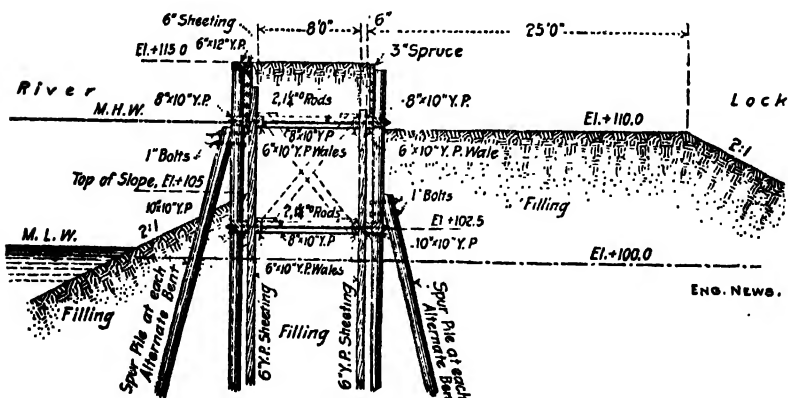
Details of Double Wall of Sheet-Pile Cofferdam, Charles River, Boston, Mass.
